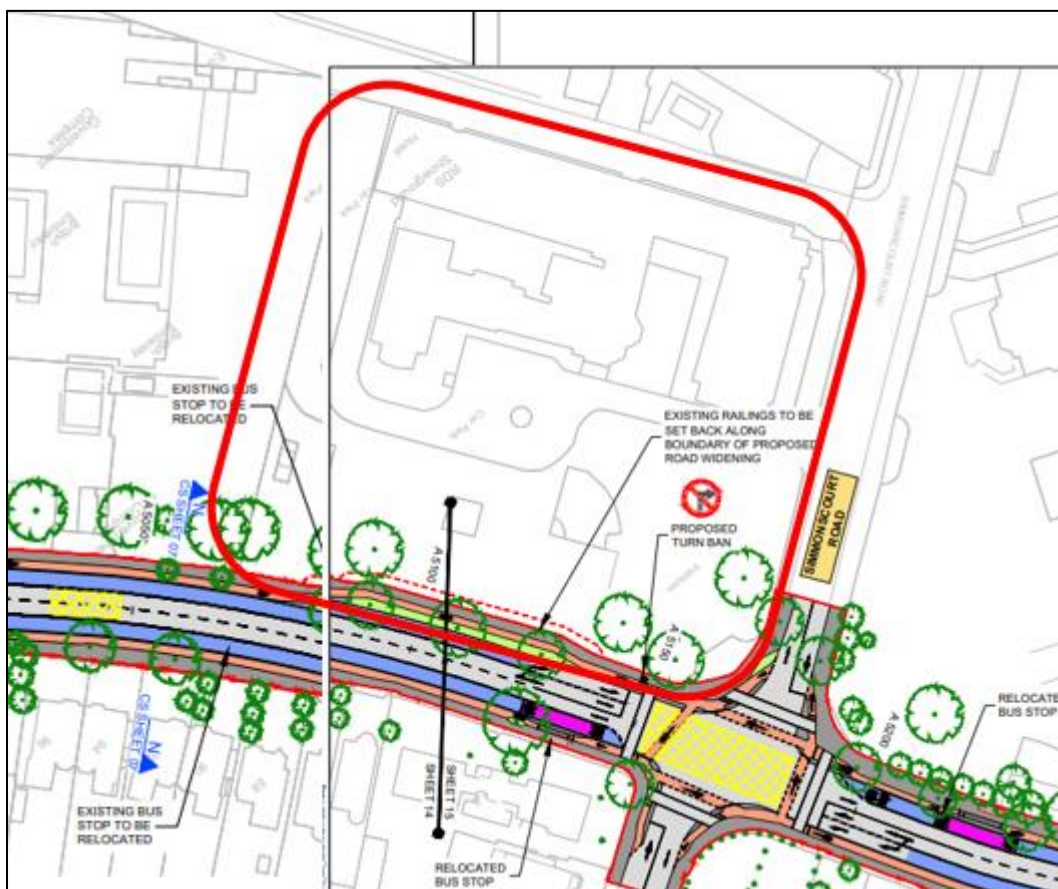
Proposed new Layout at the Clayton Hotel Merrion Road
